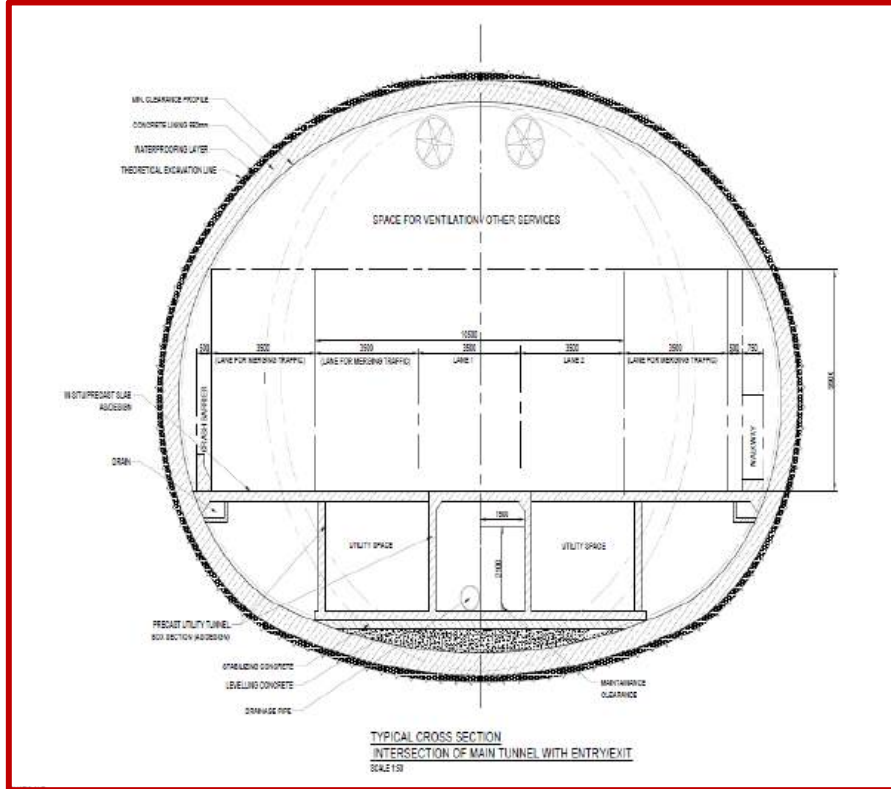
Typical Cross Section for merger section of Entry/ Exit Ramps & Main Tunnel
